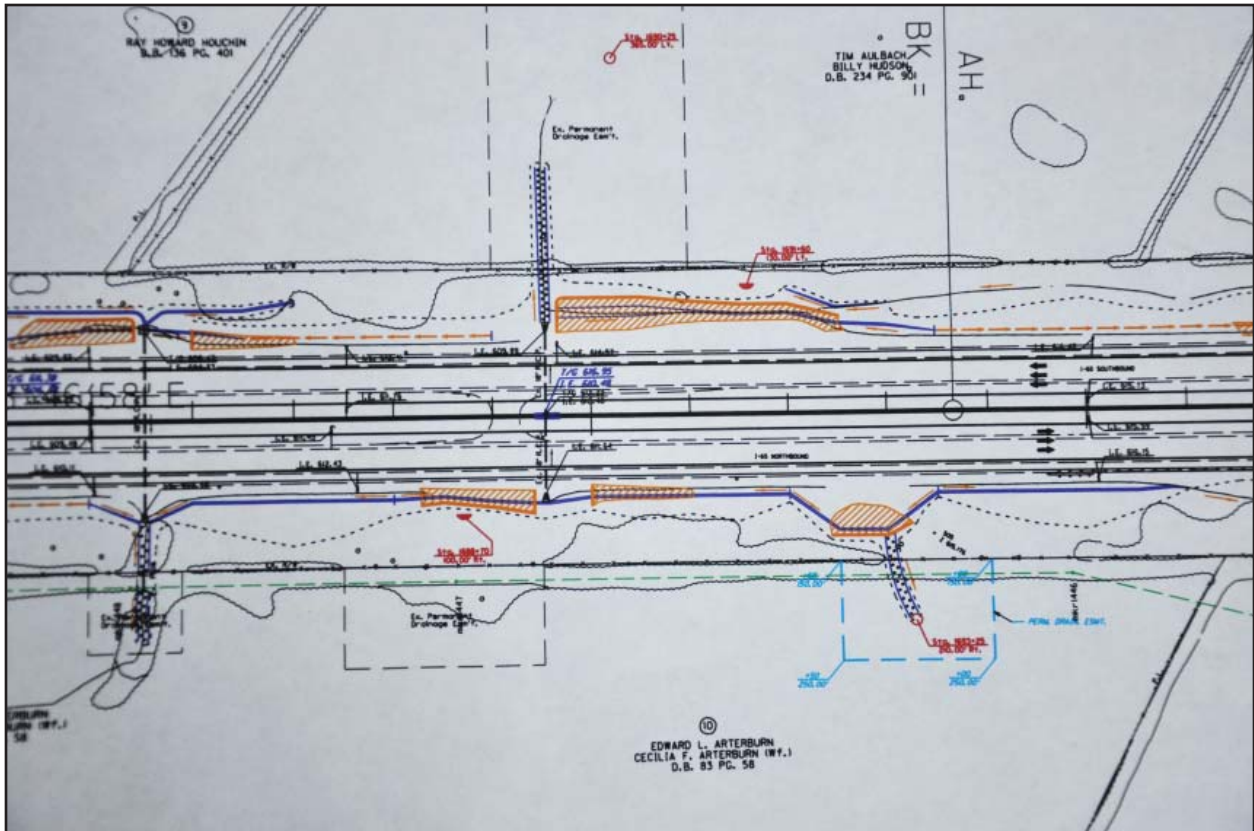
Detail from I-65 drainage plans south of Park City. Planned retention/filtration structures are shown as hatched enclosures.
